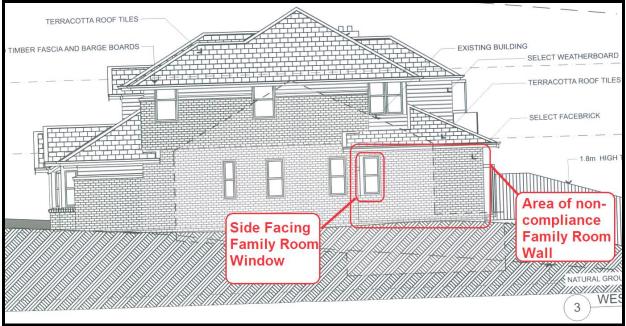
Image showing the Western Elevation of 9 Eric Street, Eastwood with highlighted areas demonstrating non-complying portion of the Family Room wall and the Family Room Window location.
